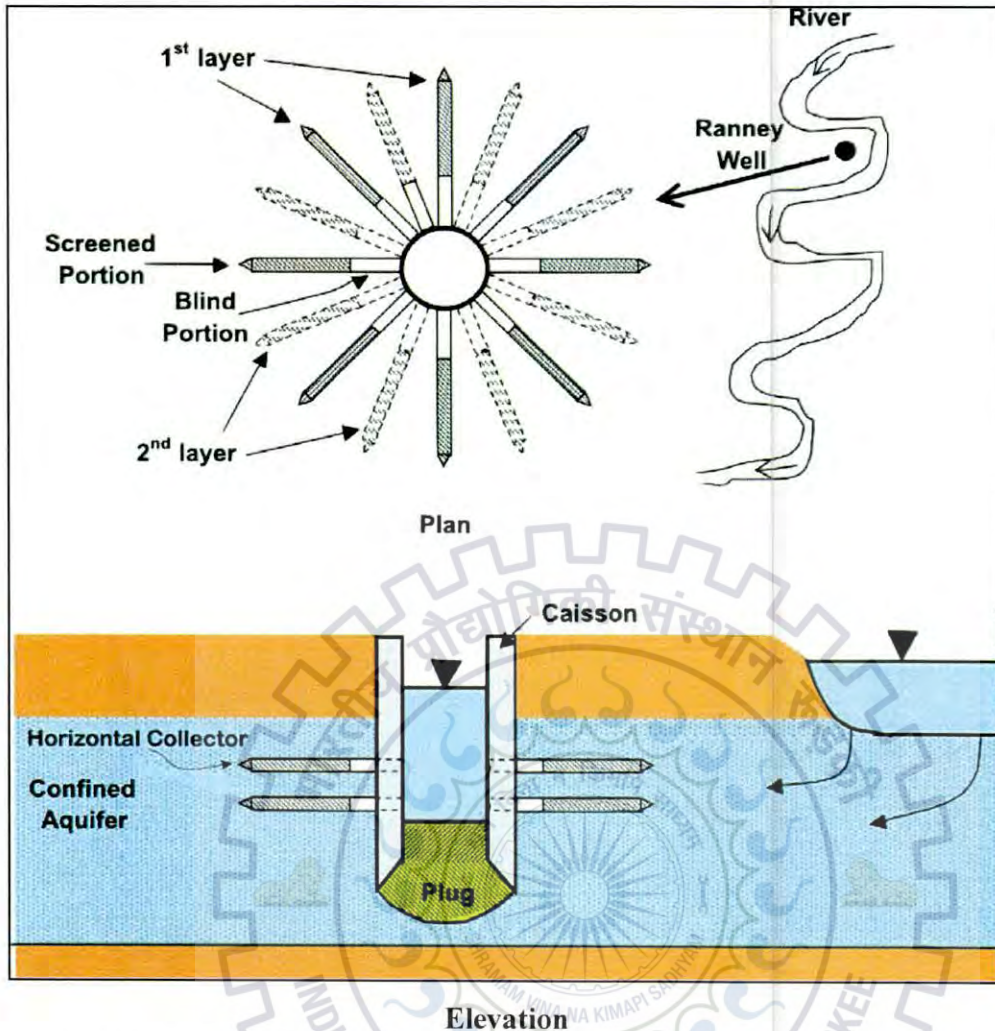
Plan and Elevation of a typical Two-Tier Radial Collector Well
